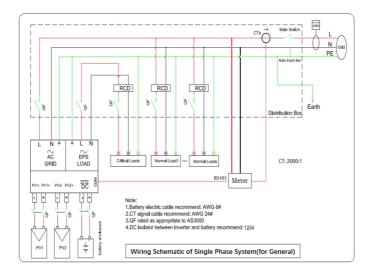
Electrical connections (Plan B:Meter +CT)
